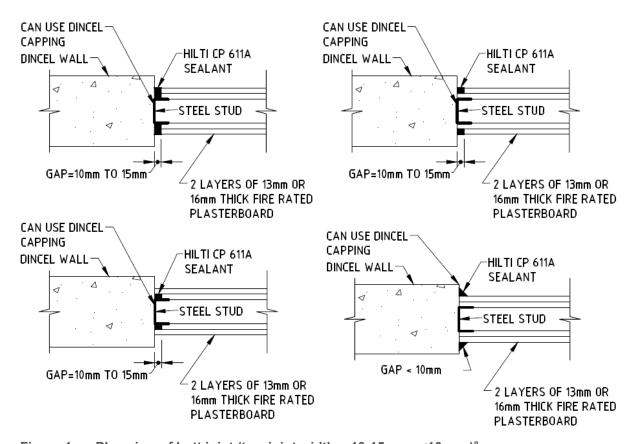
Plan view of butt joint (two joint widths: 10-15 mm, <10 mm)⁸
